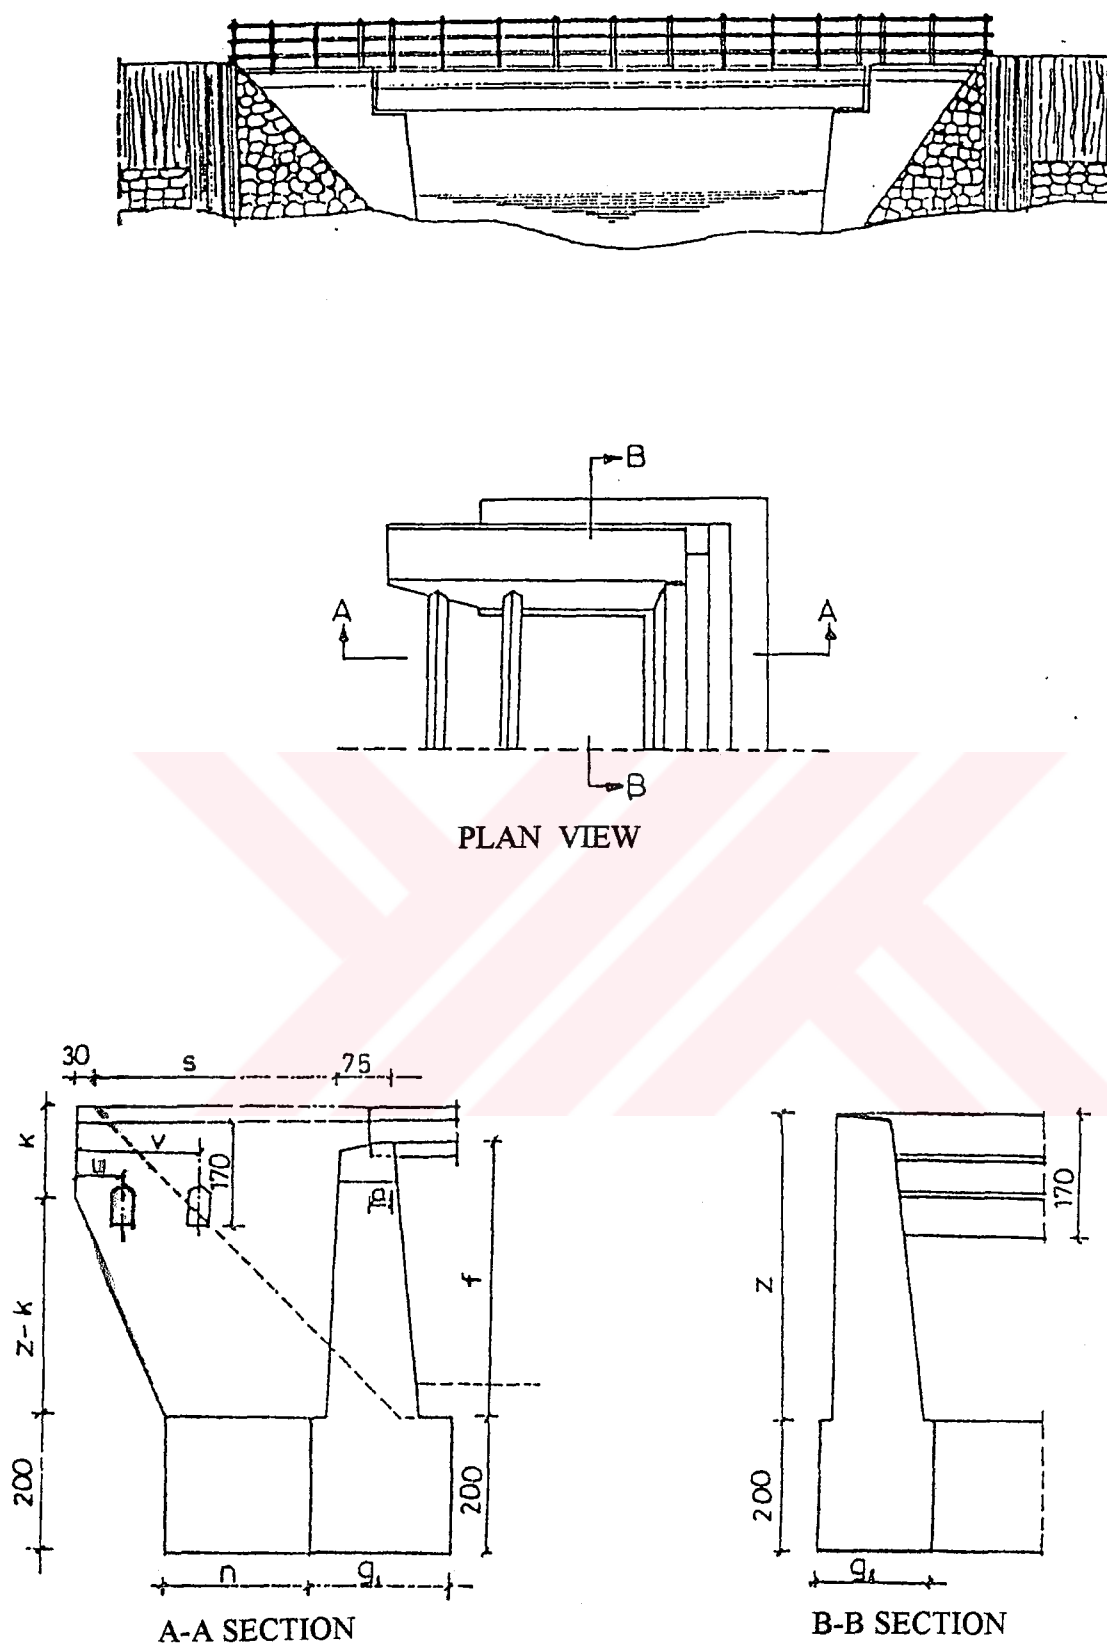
General and cross-sectional view of a bridge culvert (Aşkan, 1996)
